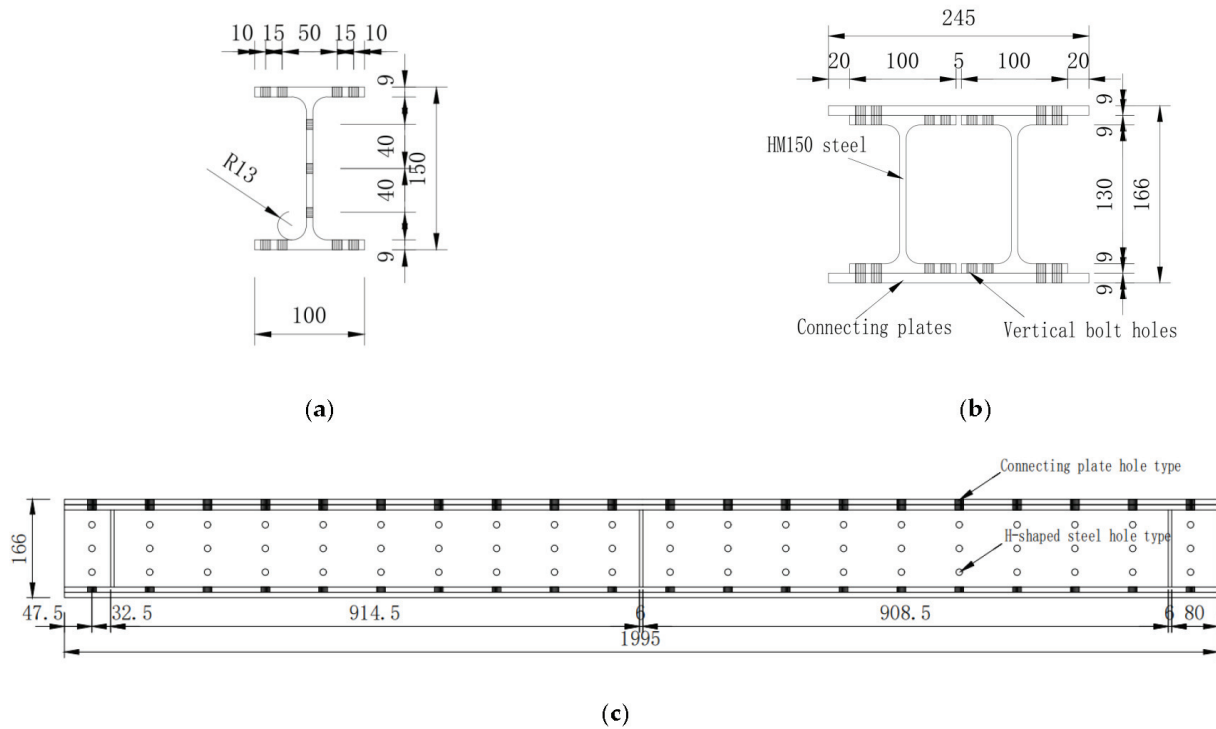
Schematic diagram of the cross-sectional parameters of the prefabricated H-shaped steel beam component specimen. (a) HM150 Steel Section; (b) Prefabricated H-shaped Steel Beam Component; (c) Side elevation view (using BC9-HC9 as an example).
